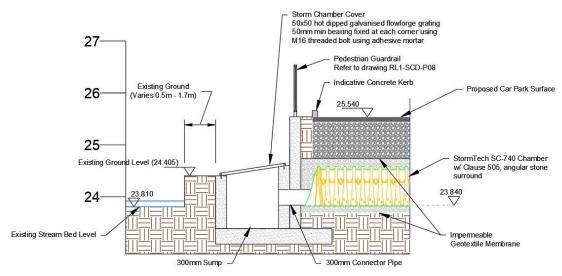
Cross-section of proposed flood storage with flood water receiving chamber
